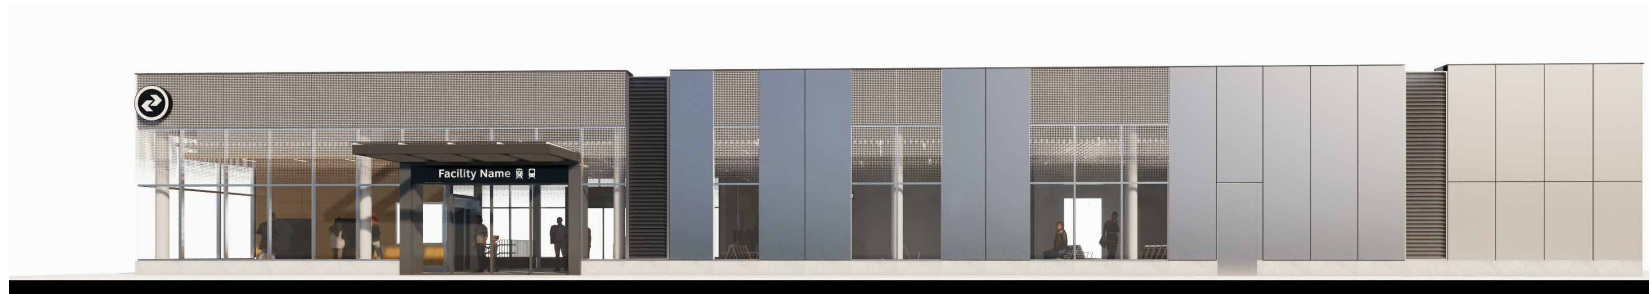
Staffed Station building (Tunnel platform access) Plaza Elevation rendering showing Platform Access, Station Ambassador and Ancillary Modules
